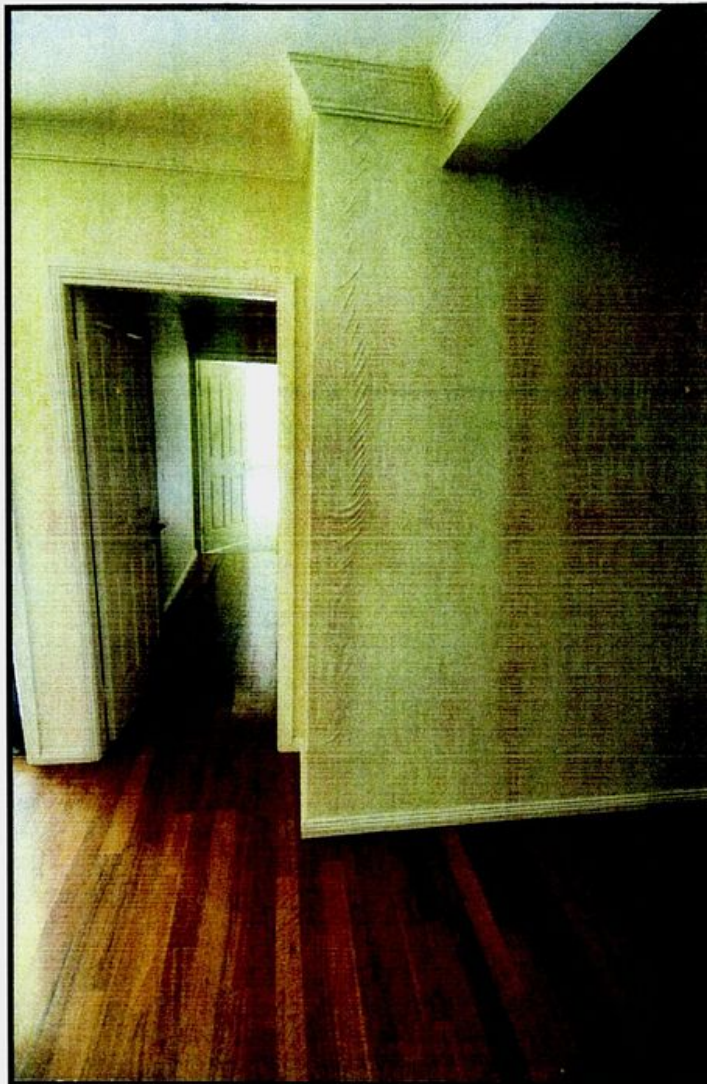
Result of flood testing two days after – water down Kitchen wall from Ensuite bathroom – note displacement of paintwork on the wall.
